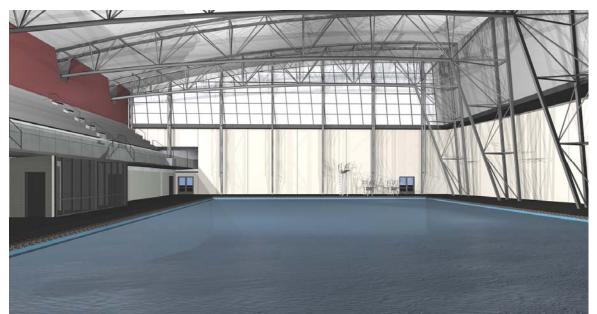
Rendering of Indoor Pool Area Showing Large Curved Trusses
